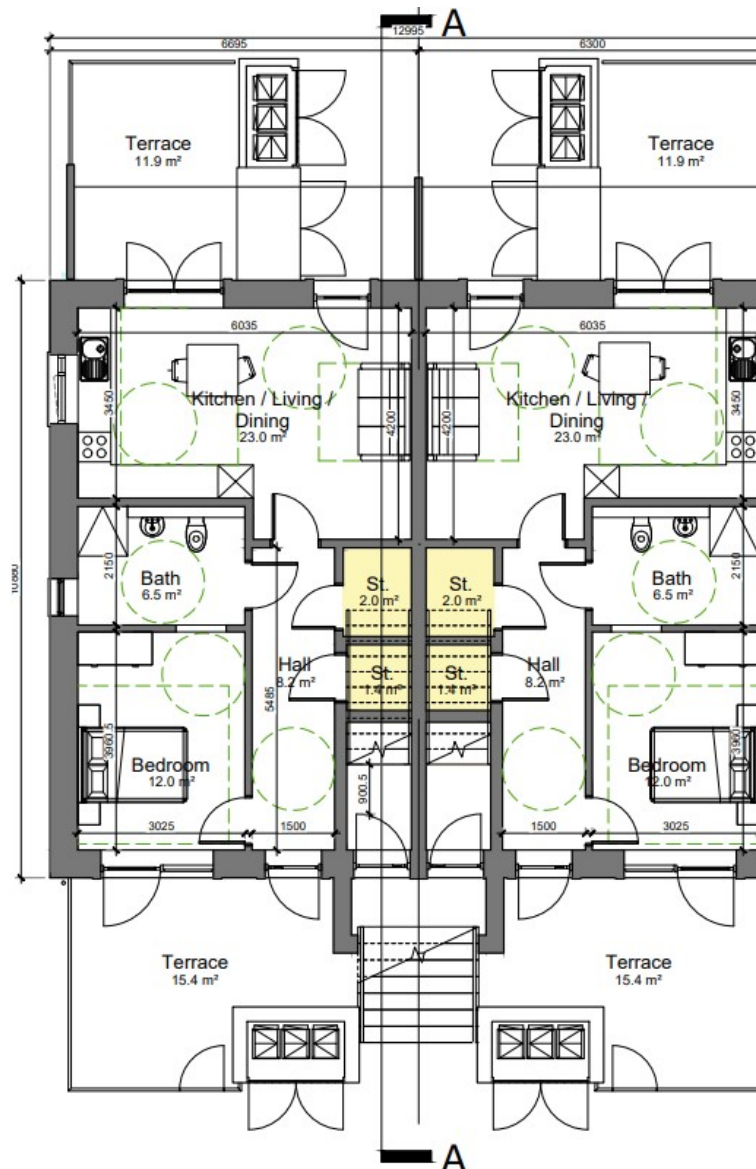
Extract from Landscape Architects drawings showing typical maisonette bin storage area (source: NMP)
